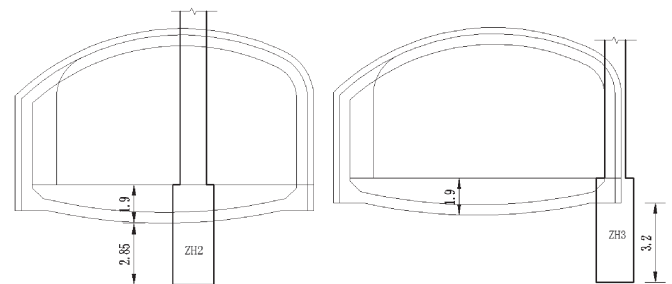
ZH2, ZH3 Foundation and the Location of the Tunnel Section Diagram
